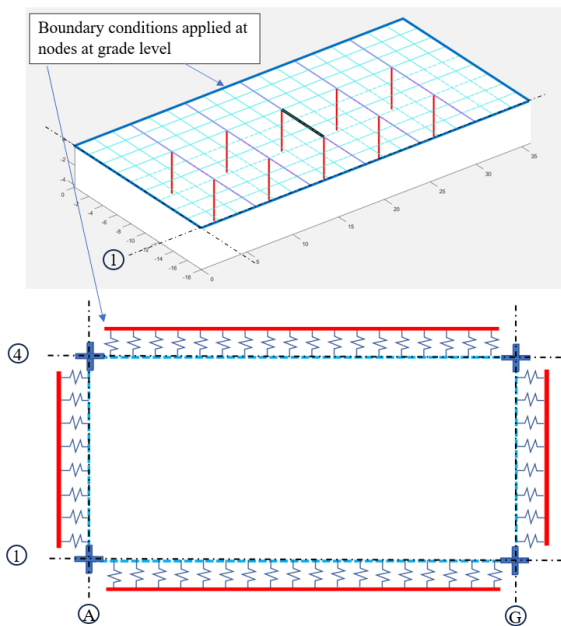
Boundary conditions at grade level – Springs in retaining wall out of plane direction, other degrees of freedom are fixed.
